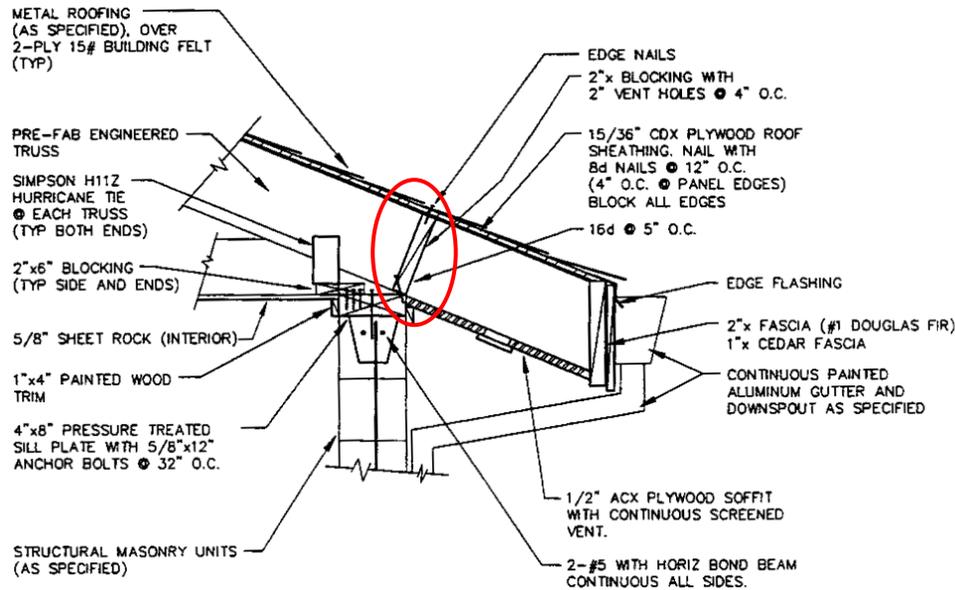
Inadequate Connection between Blocking and Masonry Wall Top Plate
